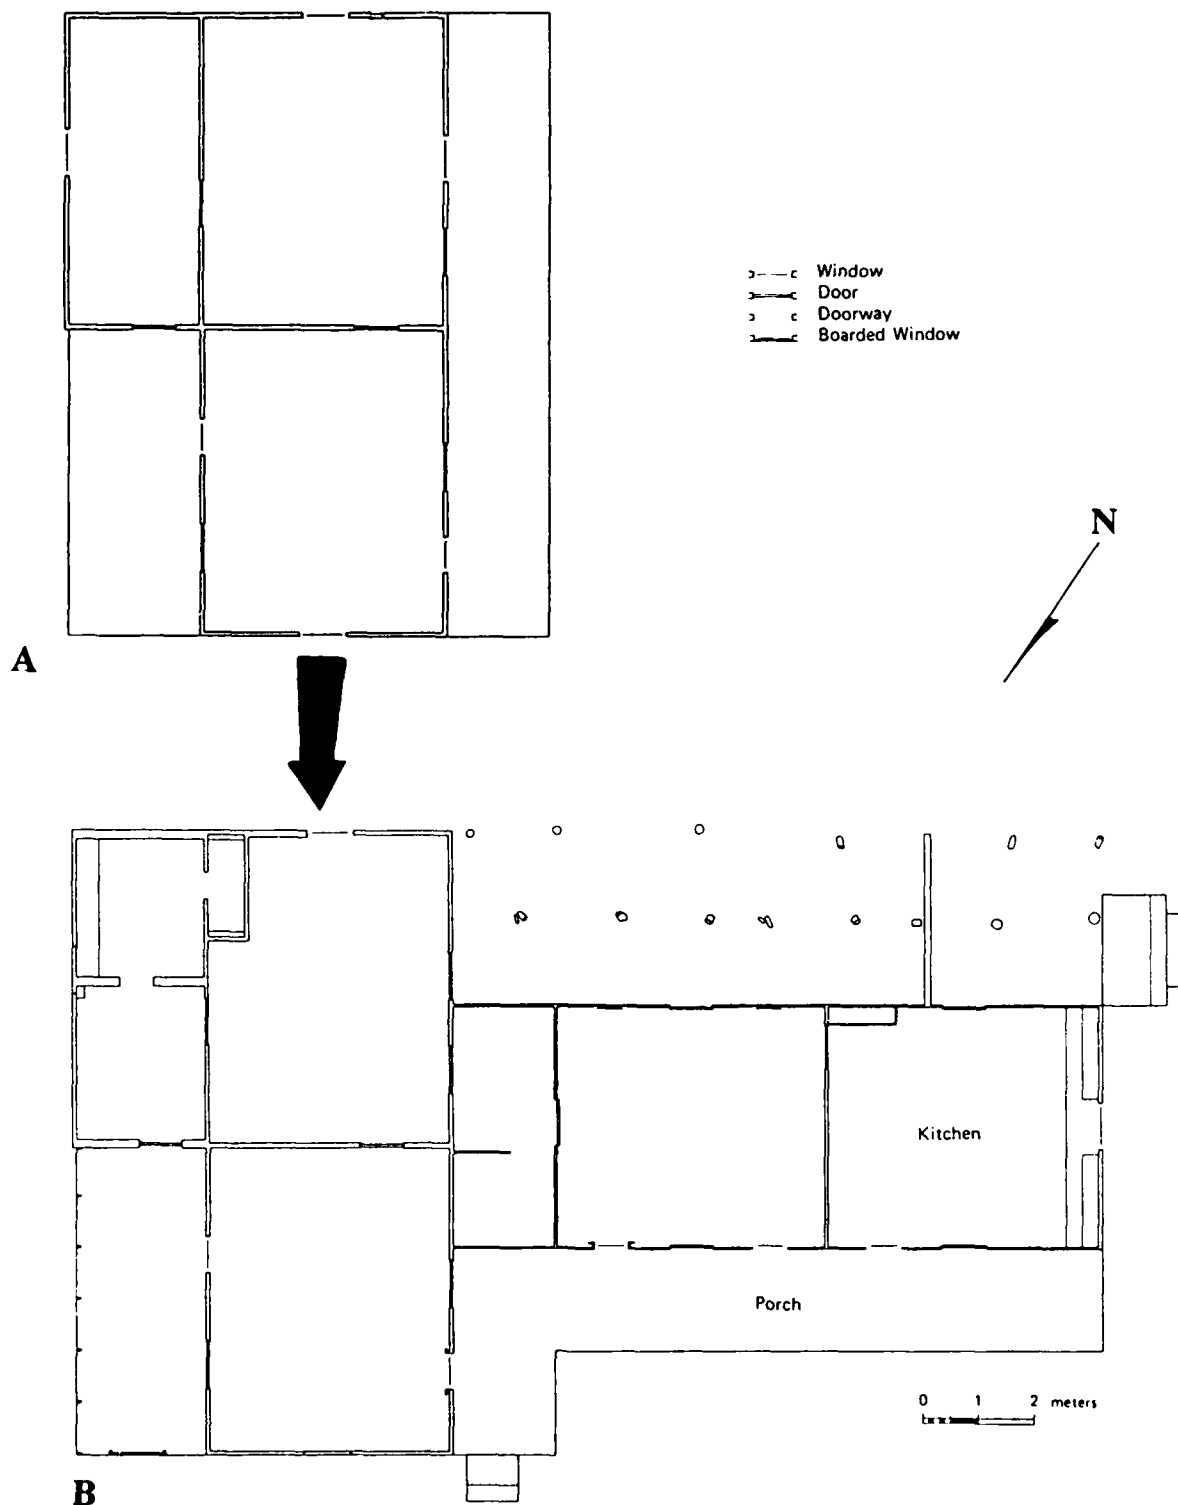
Floor plans of the house at site 41DL181 showing (a) original core, and (b) early twentieth century modifications (from Ferring and Reese 1982: 159-161).
